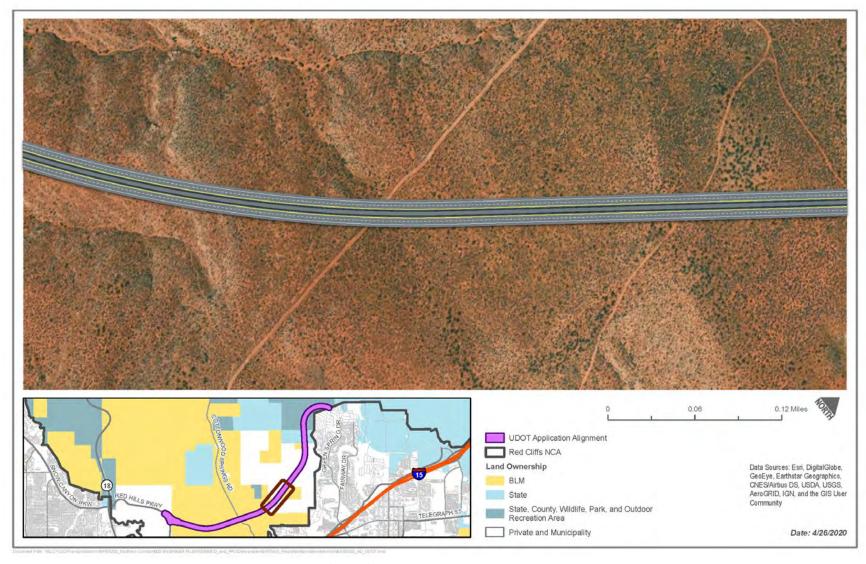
UDOT Application Alignment Plan View (4 of 9)
